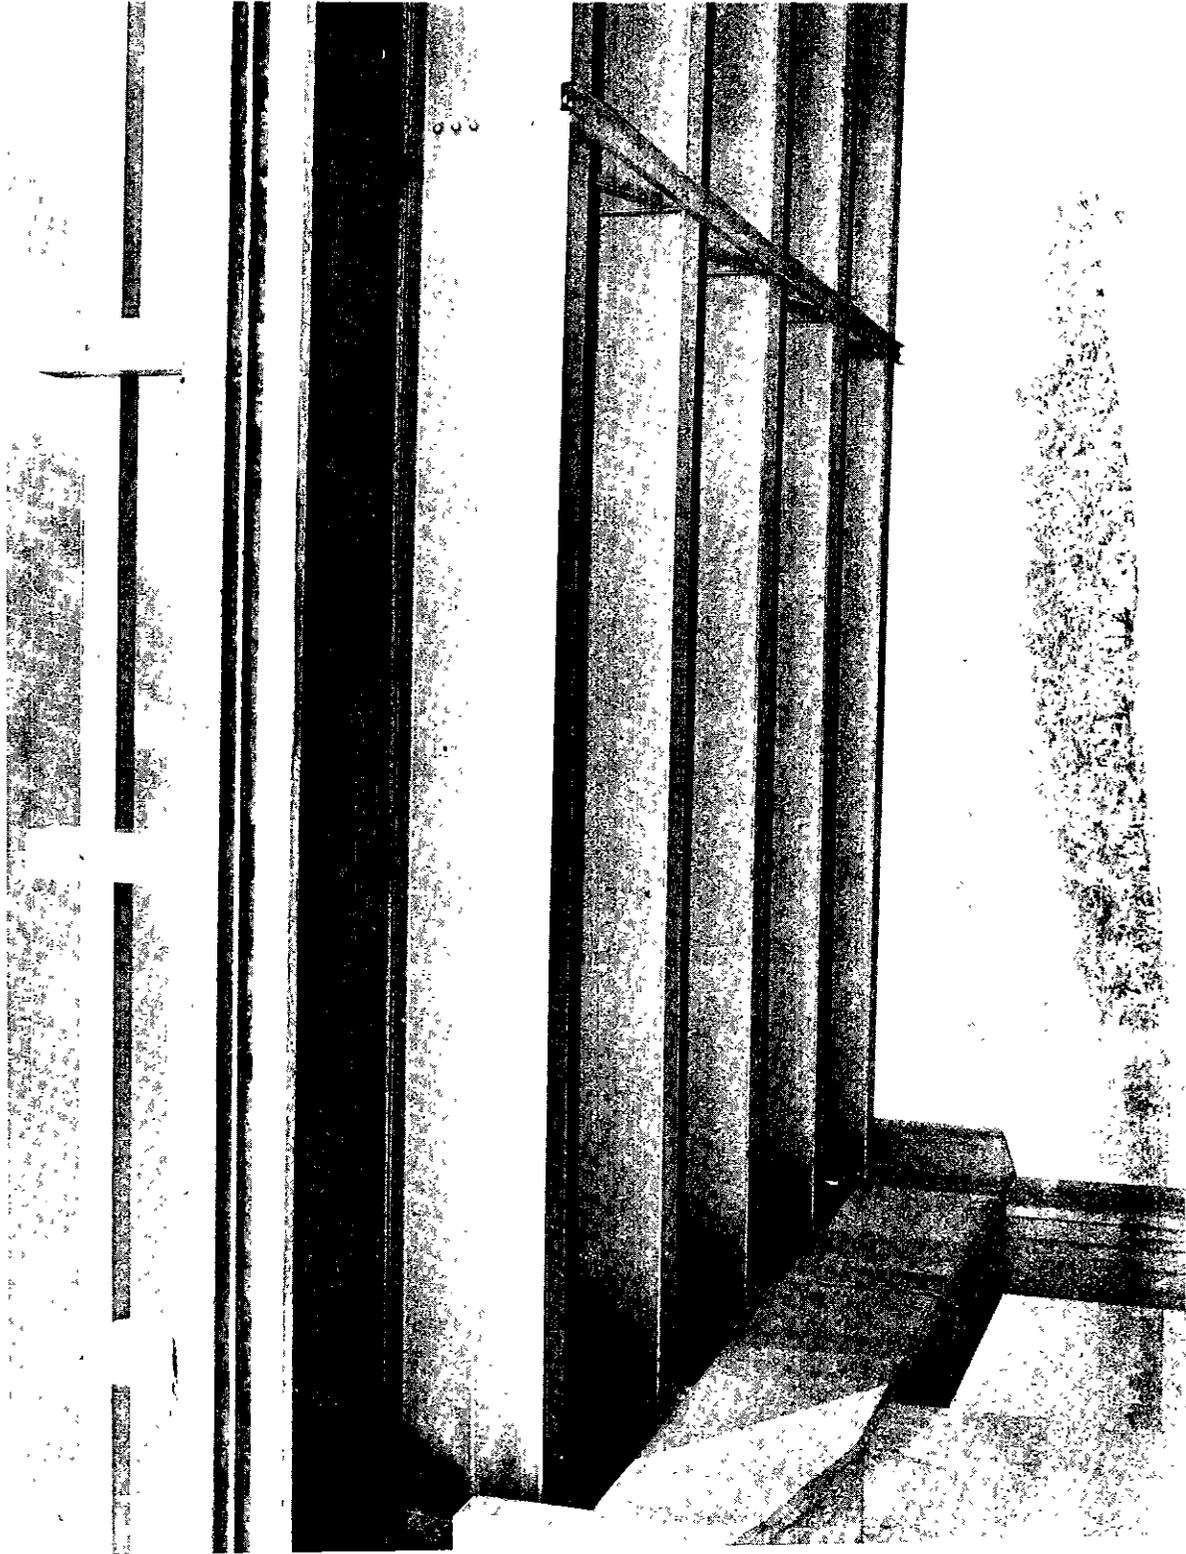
Leffingwell Creek Bridge. Span 1, North Section
